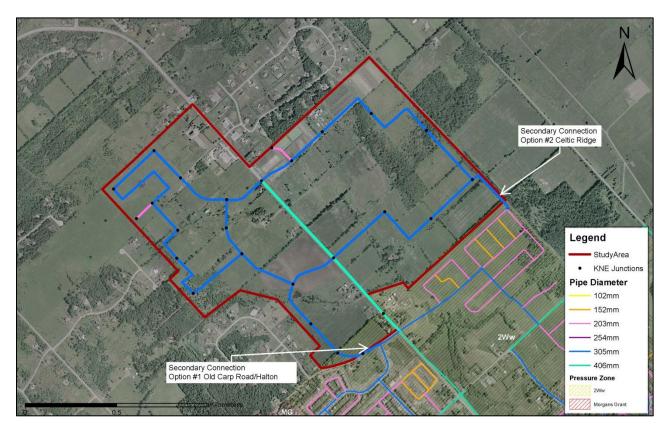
Proposed KNUE Pipe Diameters (mm) & Access Points to Existing Infrastructure
